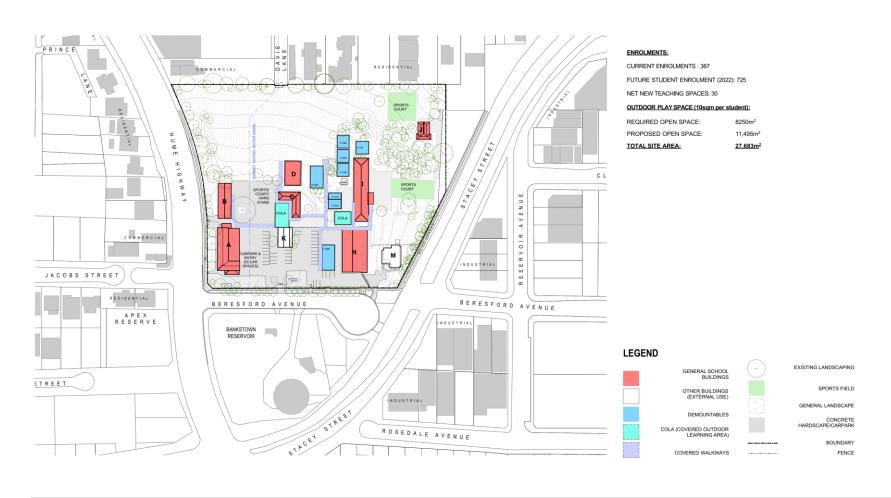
Showing the existing site plan of Bankstown North Public School (plan courtesy of JDH Architects).
